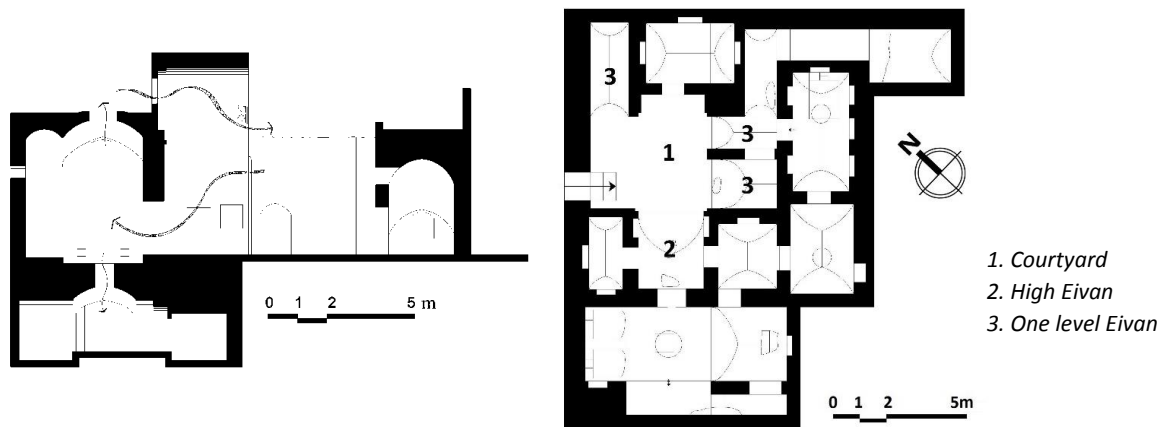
, Momtaz house, plan and section, source (YCHHTO 2013)
